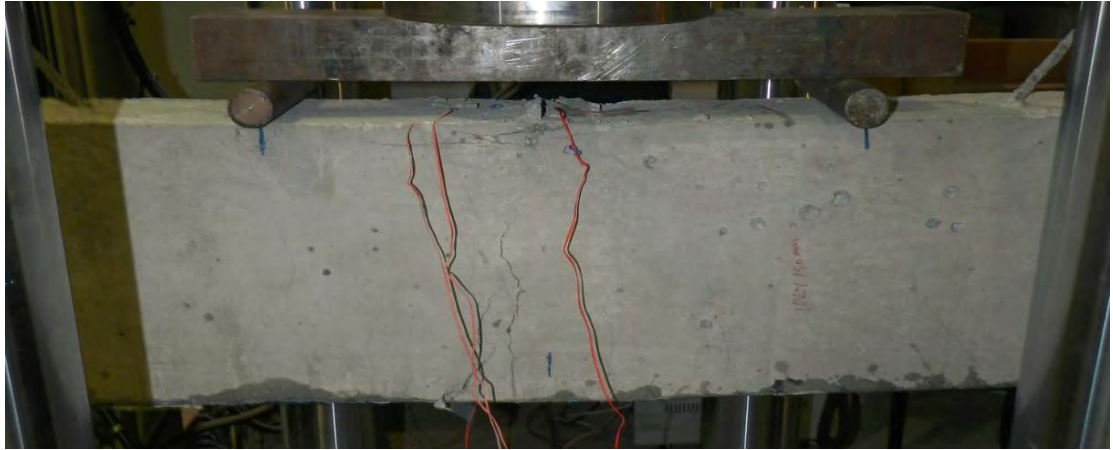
Beam (BS) concrete crushing, FRP debonding and beam failure
